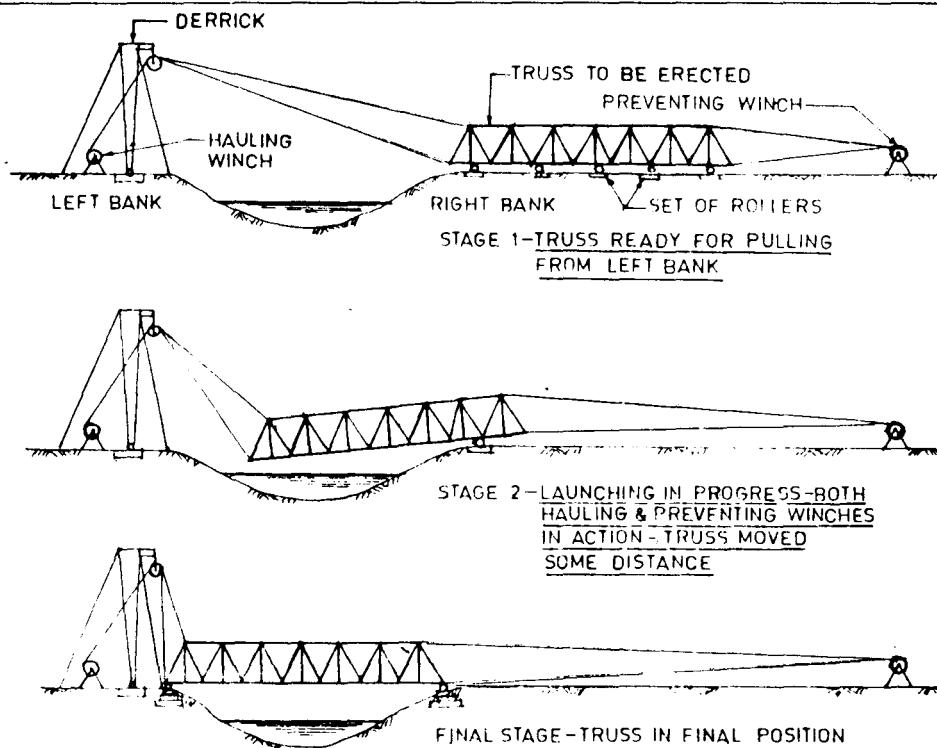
ERECTION AND LAUNCHING OF CALLENDAR-HAMILTON (UNIT CONSTRUCTION) BRIDGE (M. Engg.)<sup>2</sup>
